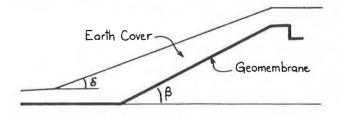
Cross section of a typical earth cover. The slope of the earth cover is not necessarily the same as the slope of the geomembrane.
